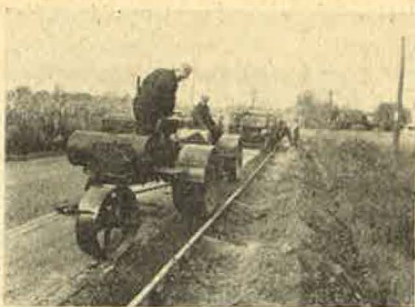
Spreading plant mix bituminous concrete in the trench (in distance) and compacting it with trench rollers.
